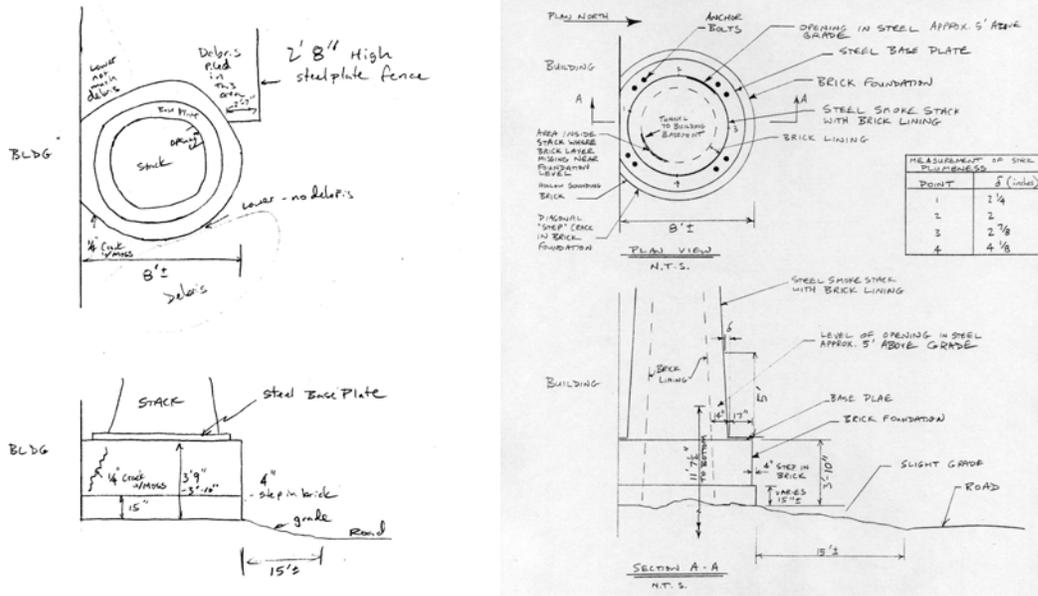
Field sketch and final sketch of smokestack foundation<sup>7</sup> (With permission of ASCE)
